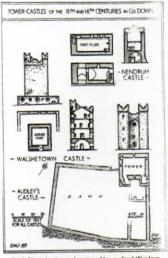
Plana, elevations and sections of late medieval (Nendram and Audley's) and 16th century (Walshestown) tower castles in Co. Down.
